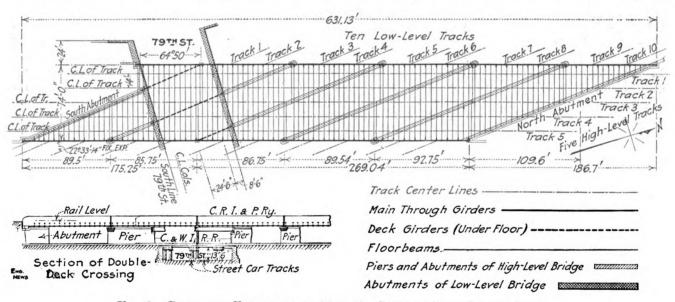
PLAN AND ELEVATION OF 79TH ST. BRIDGE; ROCK ISLAND LINES
